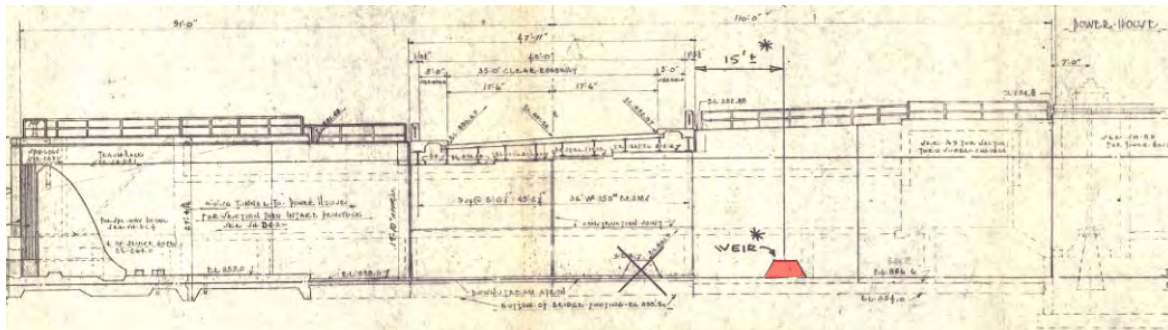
Downstream Spillway Slab highlighting weir location - Elevation Looking Left
